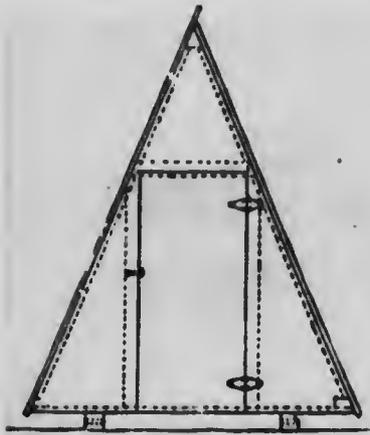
REAR VIEW OF "A" SHAPED BROODER HOUSE AND COLONY COOP SHOWING ENTRANCE
